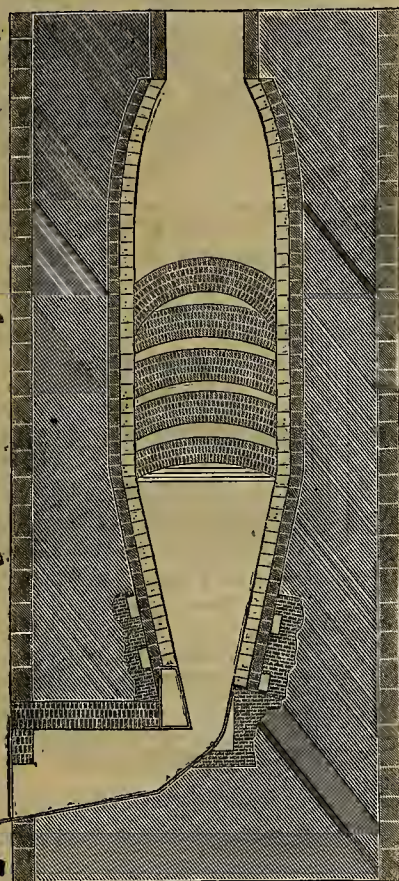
Cross Section of Furnace, Walls and Vapor Way Arches.
